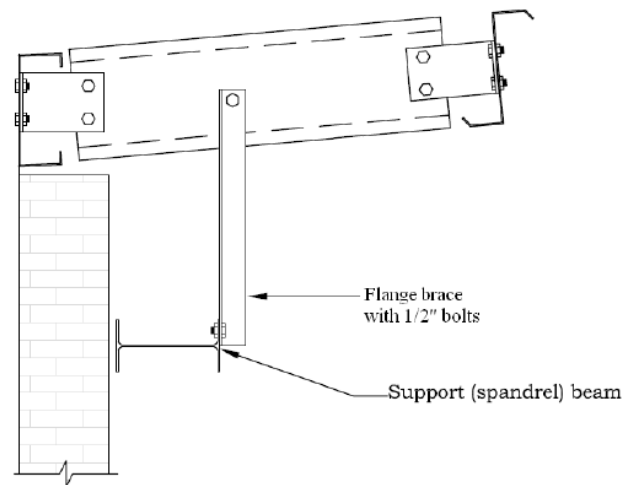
Spandrel Beam Bracing Detail (NCI Engineering 2006)
